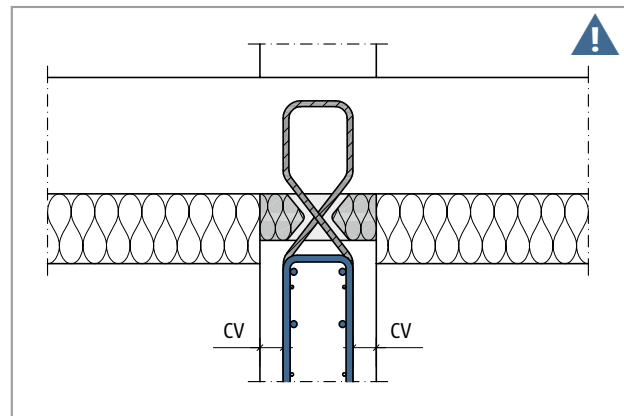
Schöck Sconnex® type W-N-VH: Variant B (for small wall thicknesses) – on-site reinforcement; the longitudinal reinforcement supports the shear force bars of the Schöck Sconnex® against the inside of the reinforced concrete structural element
